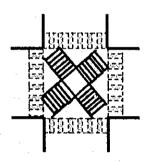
Layout of a Scramble Pedestrian Crossing
